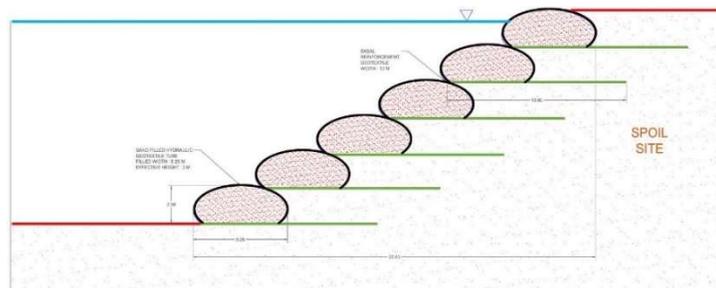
Geotubes Piling Arrangement in Magapit Narrow
